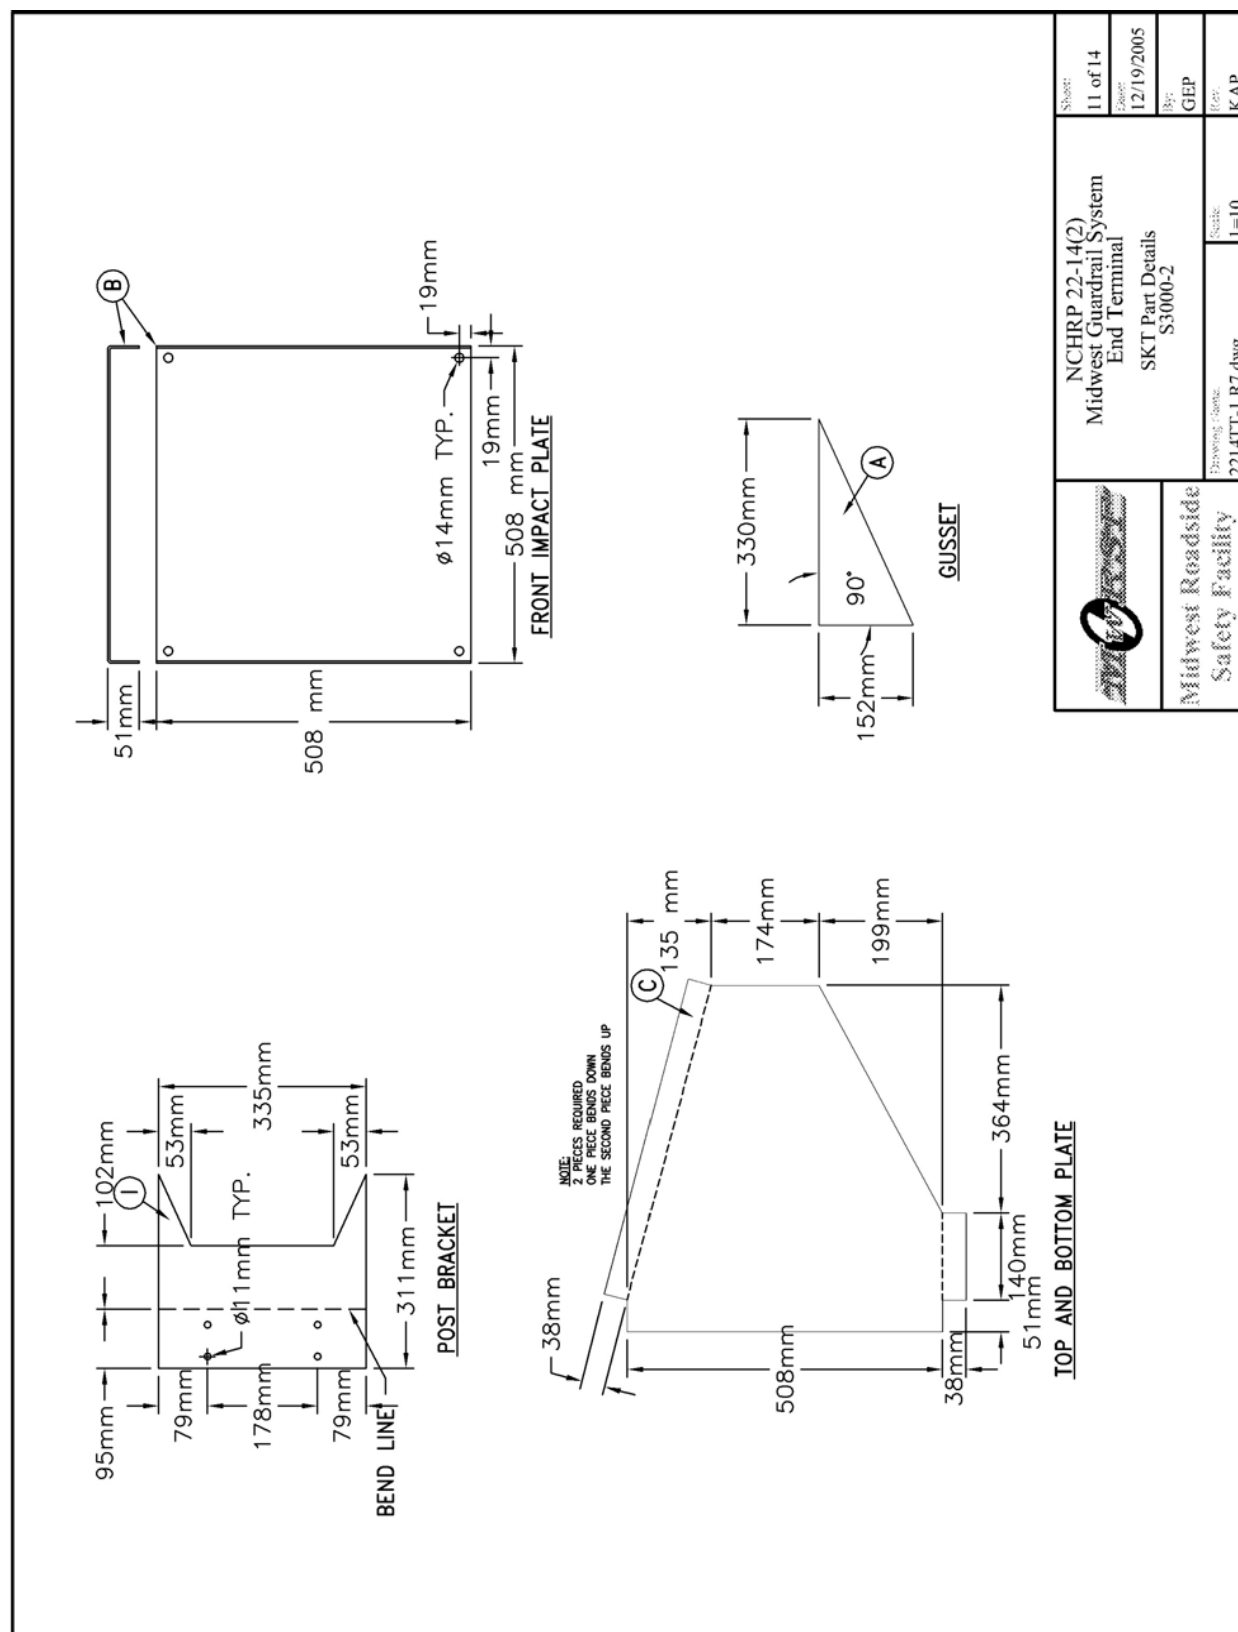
Midwest Guardrail System End Terminal - SKT Head Details
